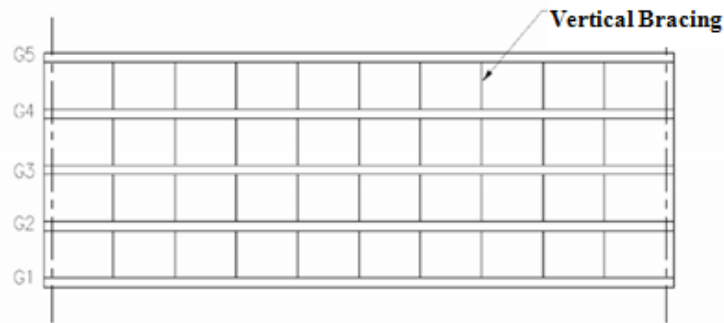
Cross-Section of a Composite Concrete Steel I-Girder Bridge.
